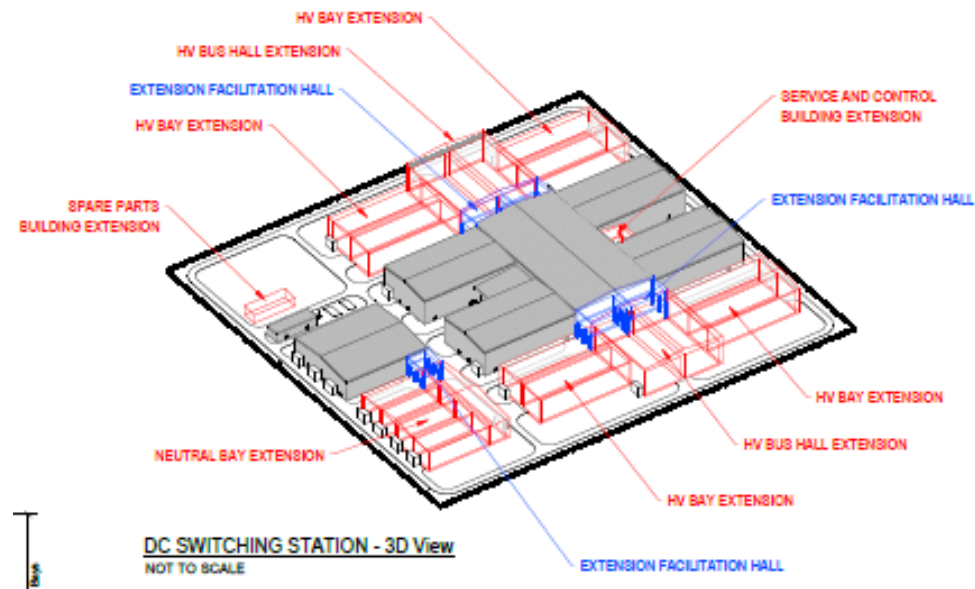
Typical Bus Hall and Bay Hall Arrangement
